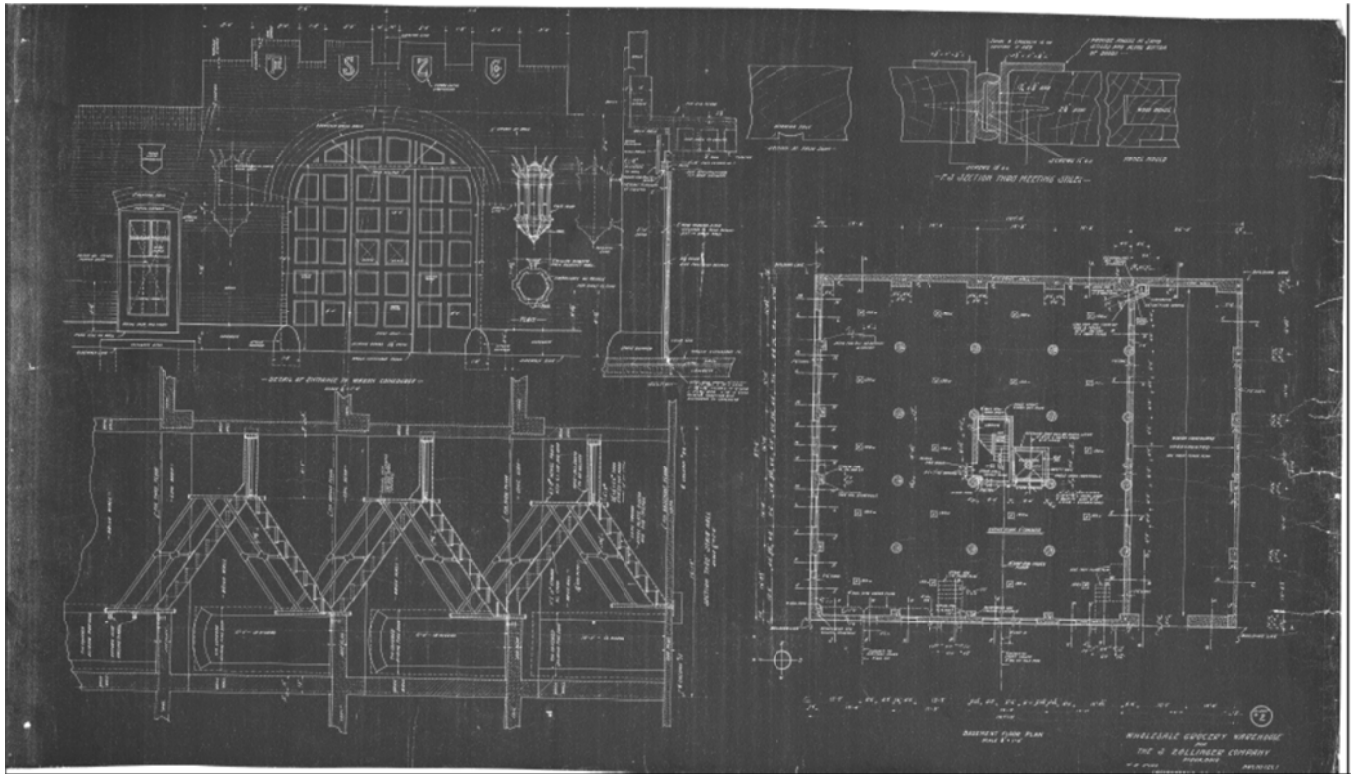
Basement floor plan, staircase and façade details of the Zollinger Building, prepared by William Earl Russ, Architect, in 1914.
